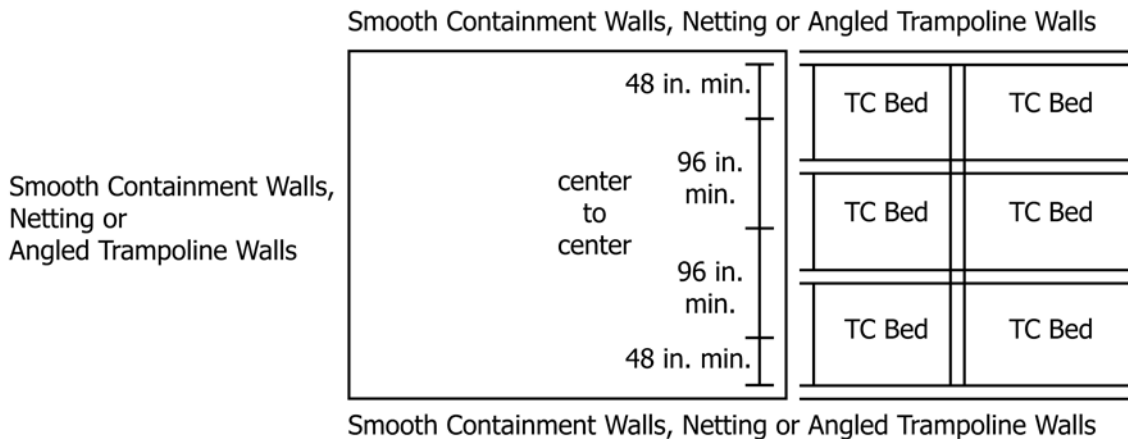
Example TC Foam Pit Overview With Smooth Containment Walls, Netting or Angled Trampoline Walls
